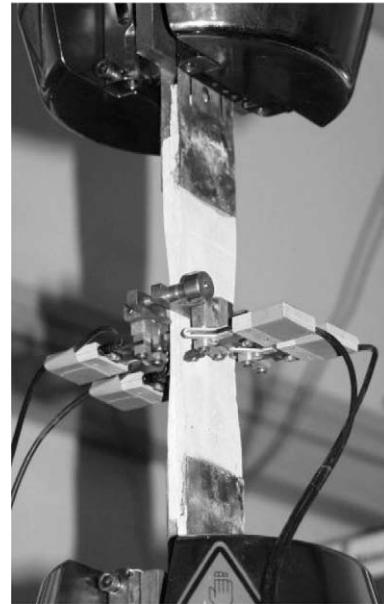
Mounted specimen with load application grips and crack width sensors.
